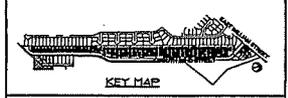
FORESTDALE TOT LOT RAMP IMPROVEMENTS/22ND STREET ACCESS
